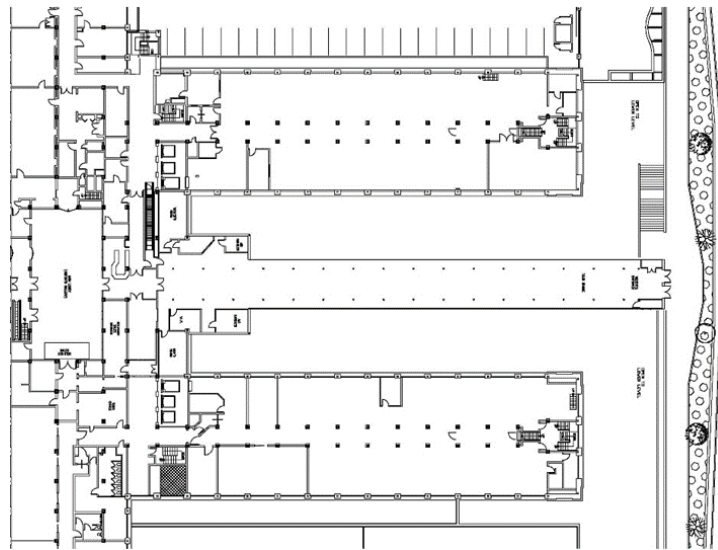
Existing site plan of entrance bridge and exhibit gallery along 14th Street
